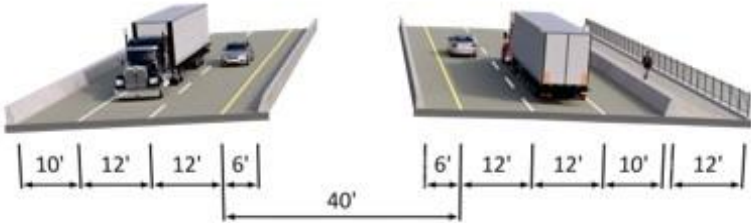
Preferred Alternative Bridge Typical Section - S.R. 70 over Harney Pond Canal C-41
